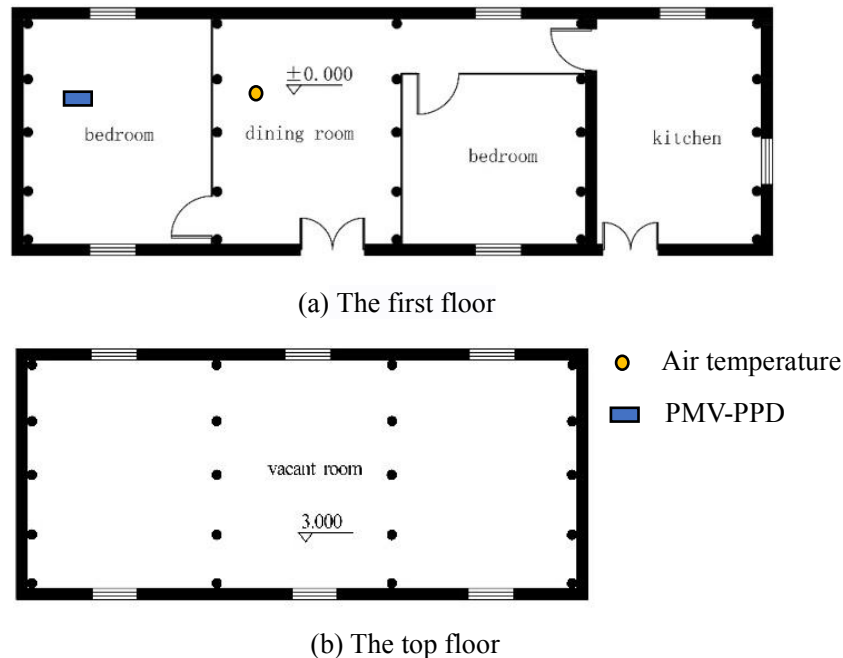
Building plans and measuring point distribution (TVB-2)
